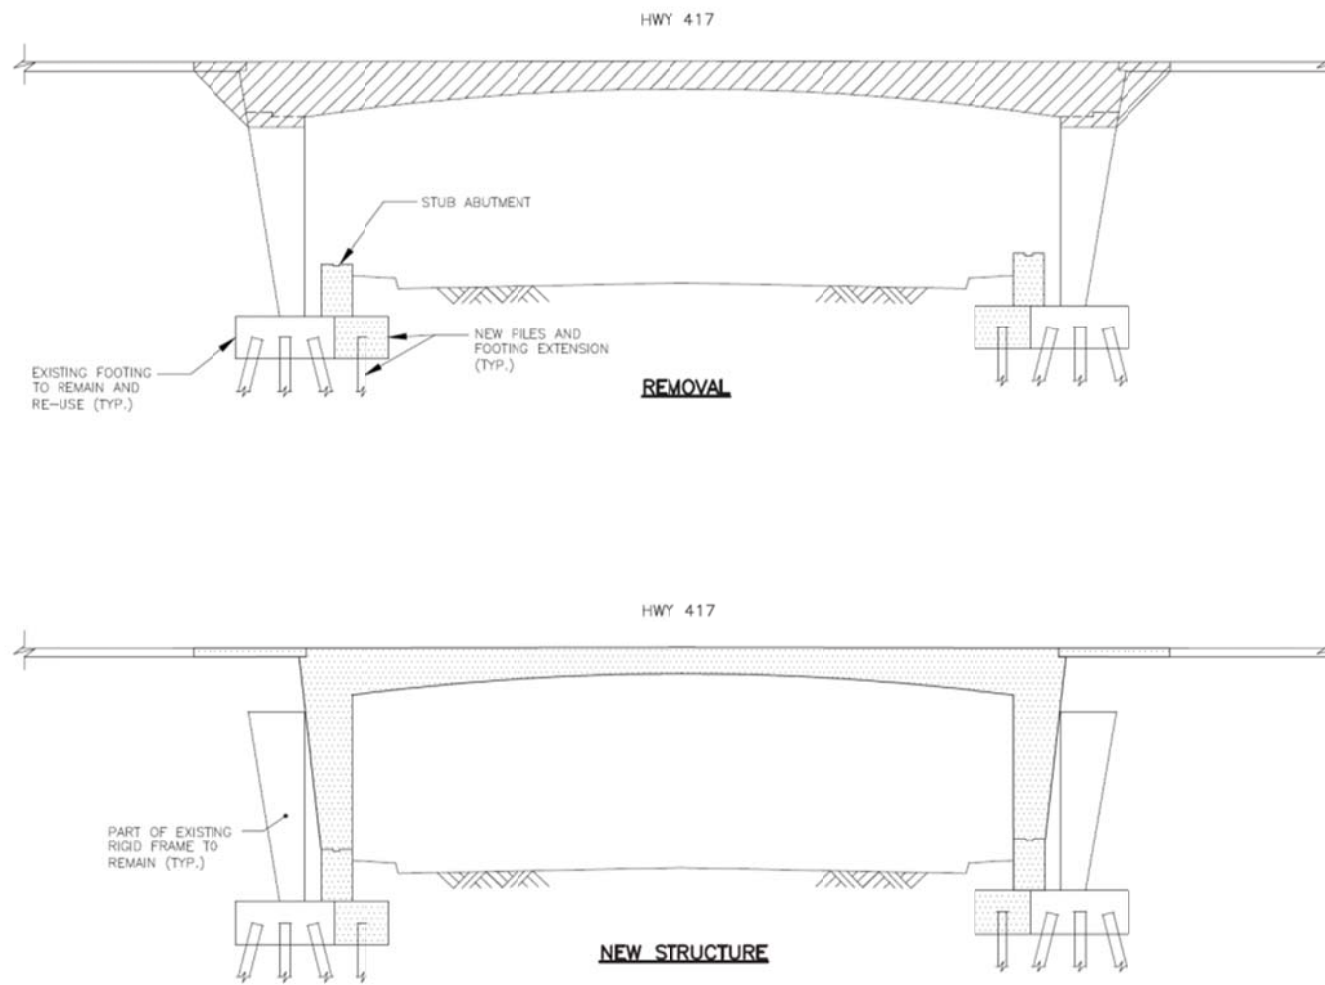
Alternative Cs – Rapid Bridge Replacement for Shorter Span
